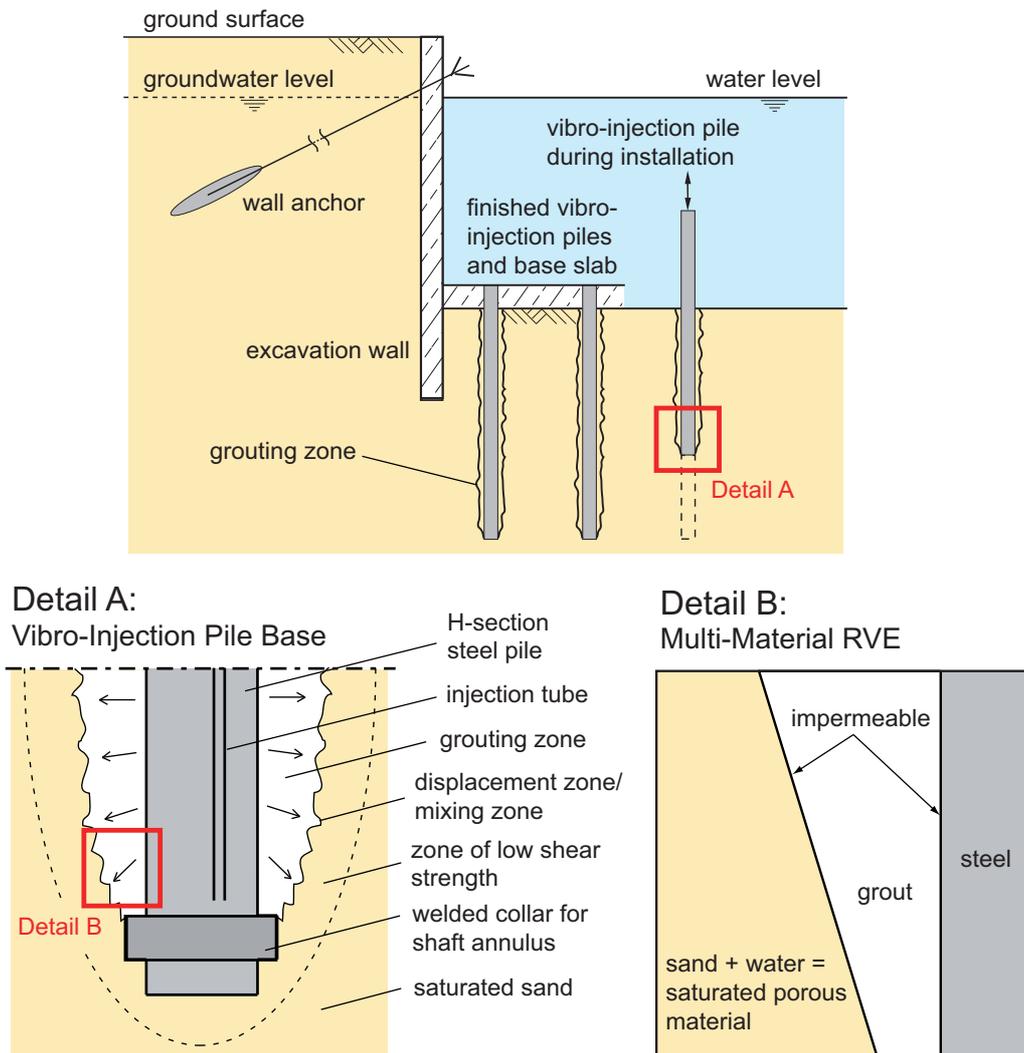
Vibro-Injection Pile Installation in Saturated Sand for a Typical Deep Excavation in Urban Area. Detail A: Phenomenology at the Pile Base. Detail B: Representative Volume Element (RVE).
